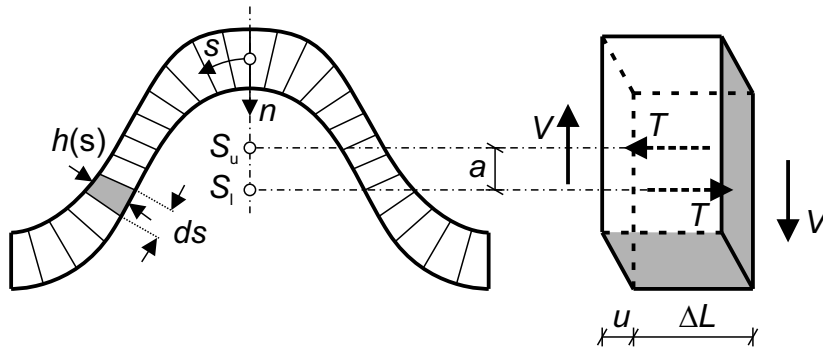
Cross-section of non-planar sandwich element (reproduced from /Sta74/)
